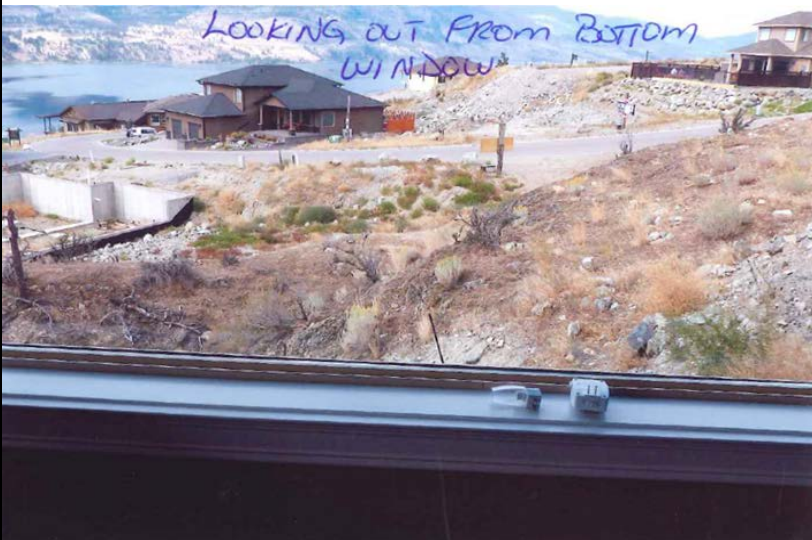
Adjacent lot looking northwest (viewed from 1st floor window).
